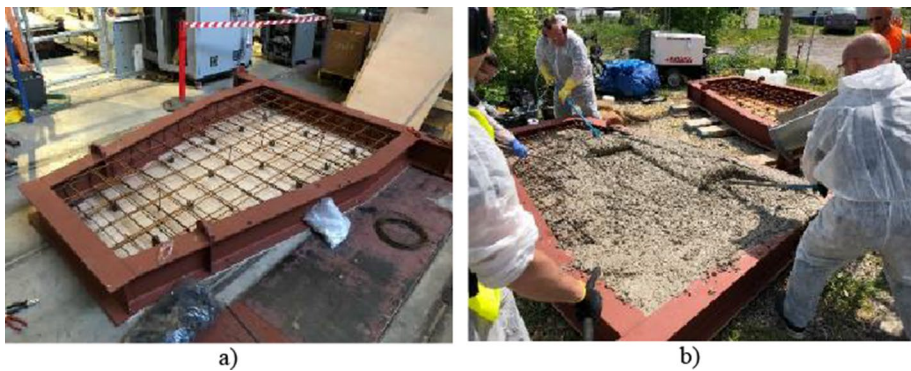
Selected images from construction of the foundation system: a edge steel frame with rebar mesh and b concrete casting
